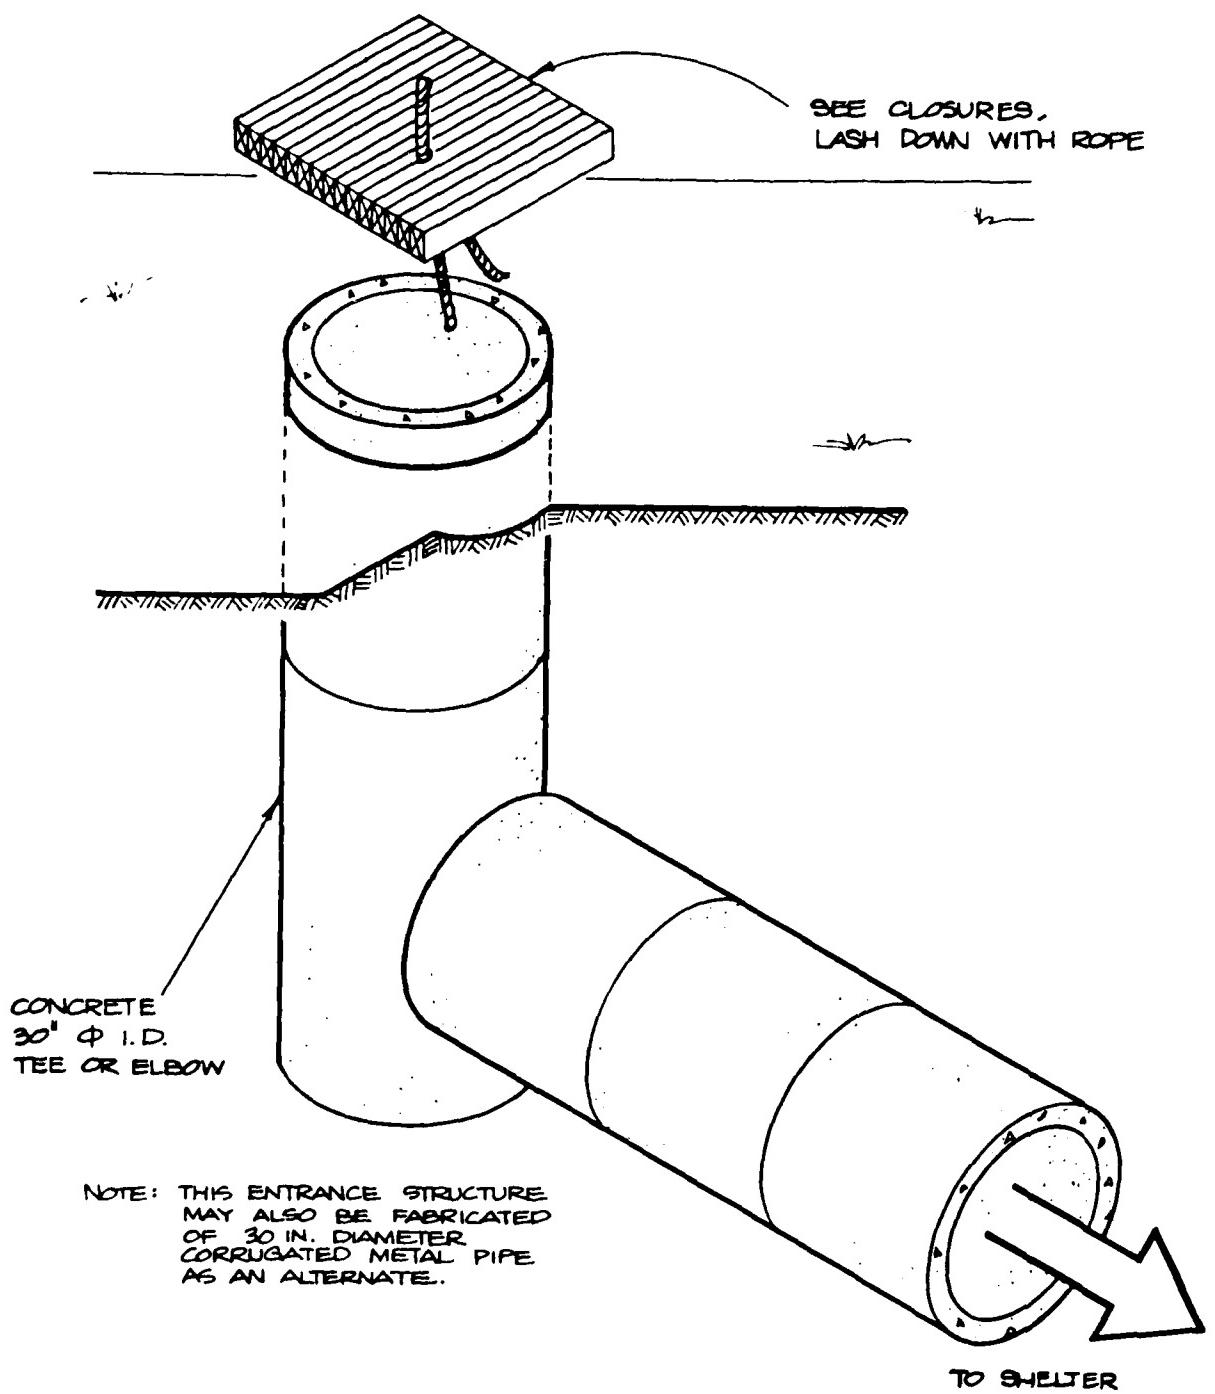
40 psi Entrance Structure to Key Worker Shelter (Concrete Pipe Construction).
